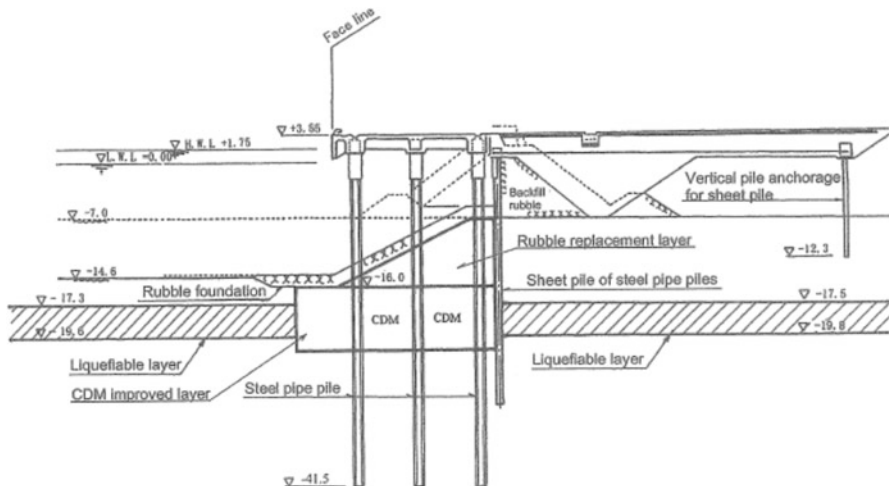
Example of ground improvement for a pile-supported wharf (PIANC 2001)
